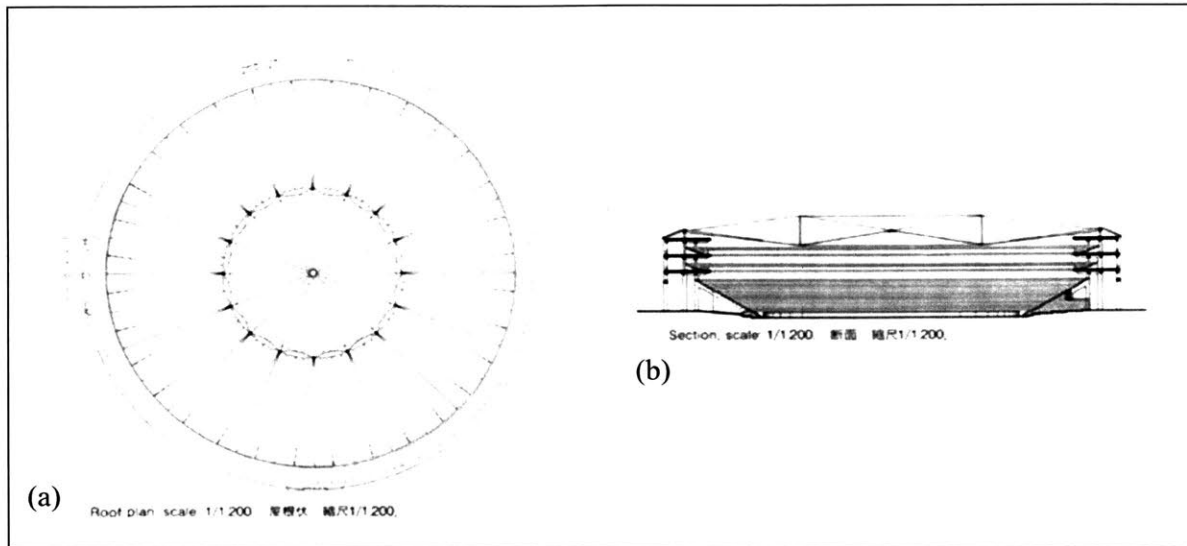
Drawings of the Zaragoza Arena roof: (a) plan and (b) elevation views (Holgate, 1997)
